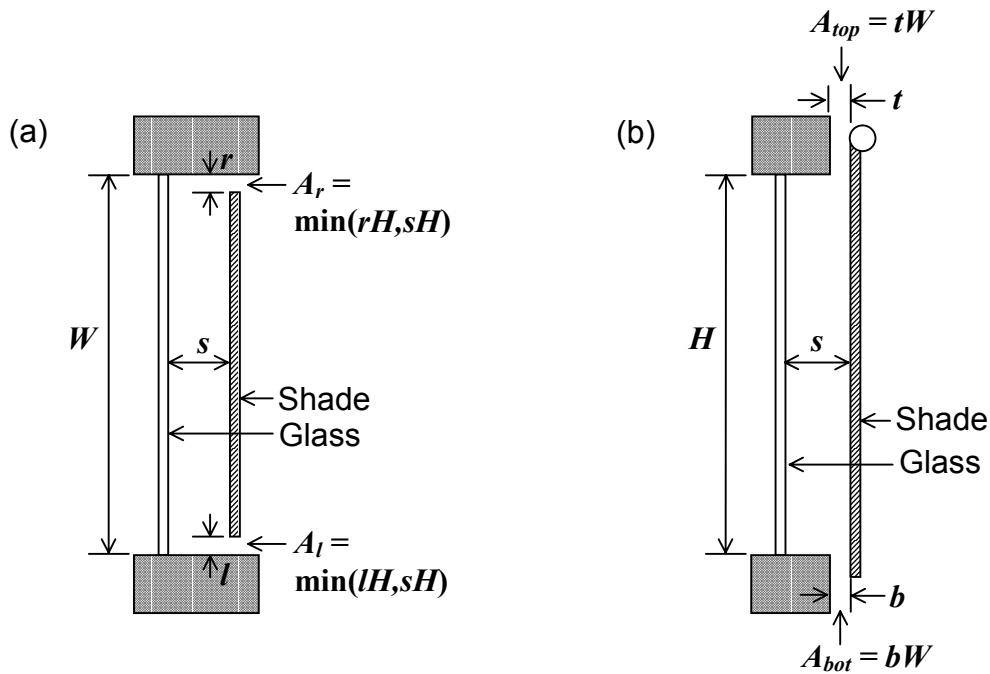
Examples of openings for an interior shading layer covering glass of height H and width W . Not to scale. (a) Horizontal section through shading layer with openings on the left and right sides (top view). (b) Vertical section through shading layer with openings at the top and bottom (side view).
